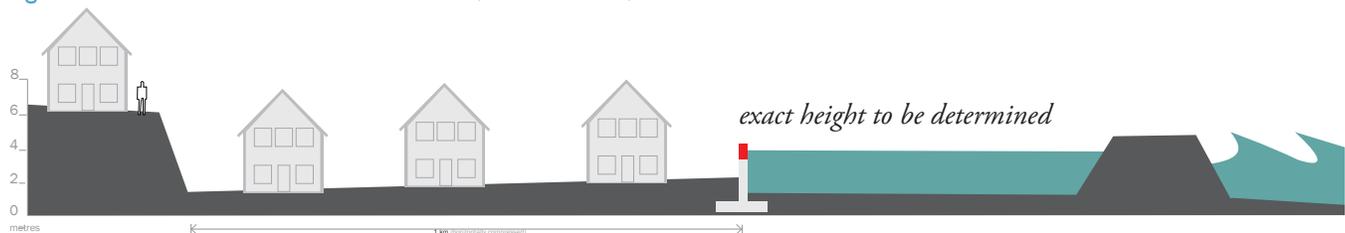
Reinforce and Reclaim Scenario, Beach Grove, Section
